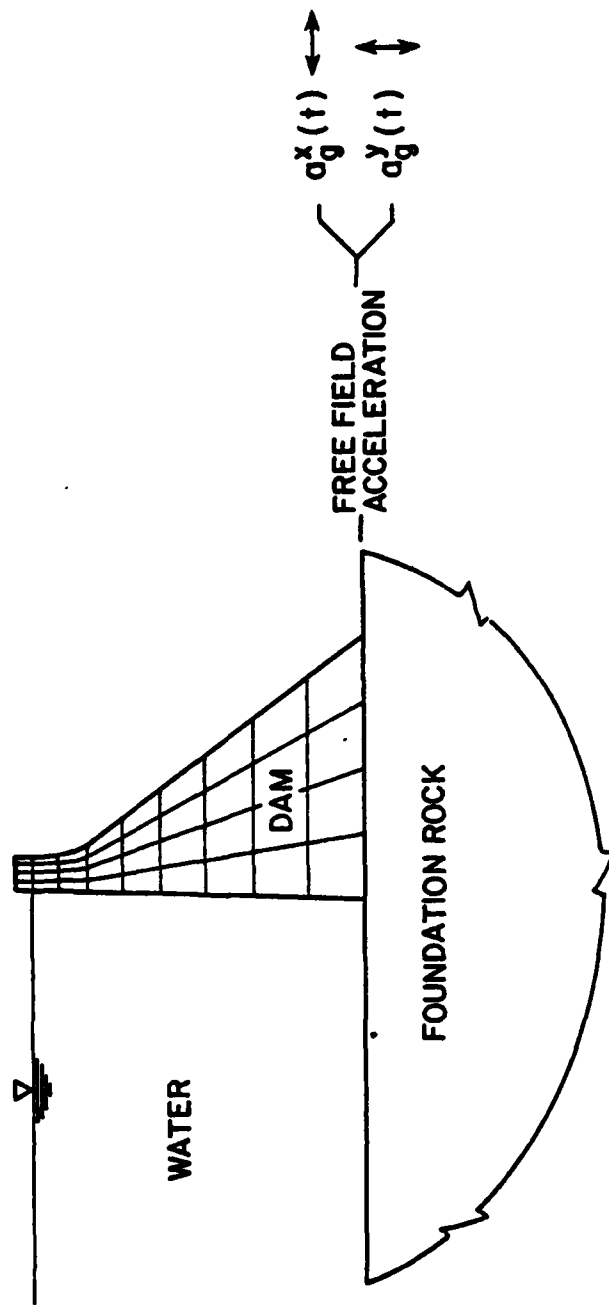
DAM-WATER-FOUNDATION SYSTEM
